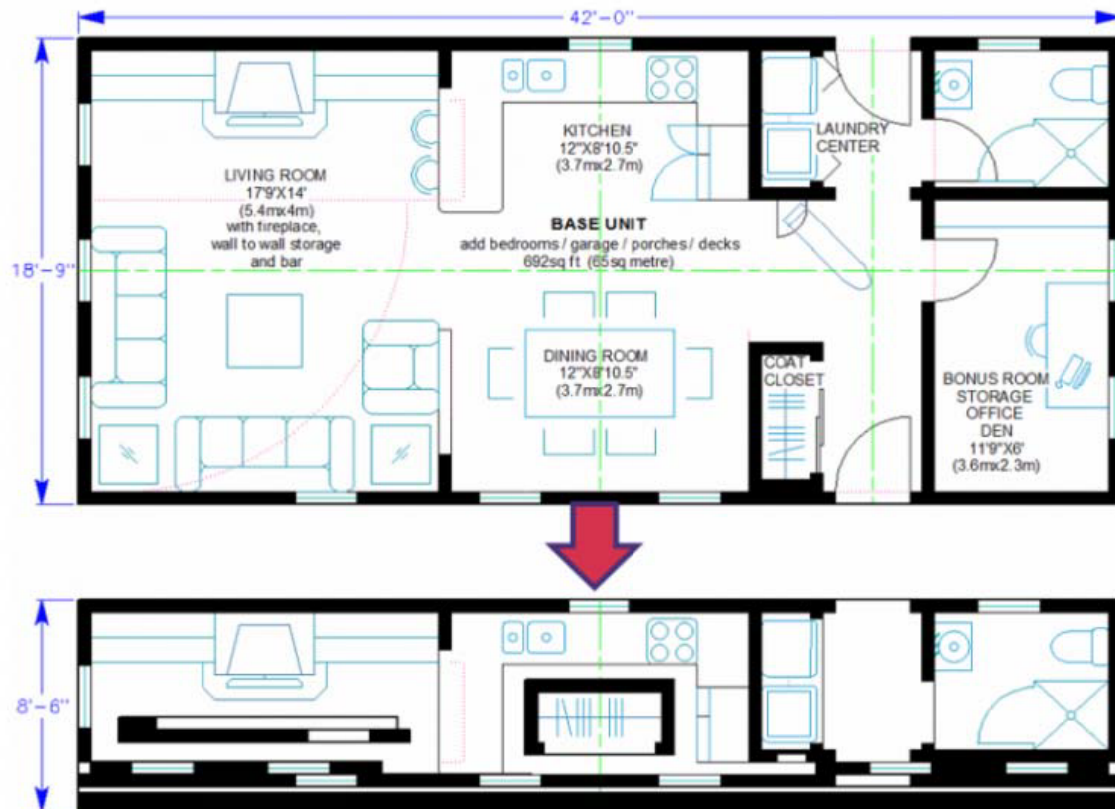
Floor plans of Boxabl homes in their open and compact forms
